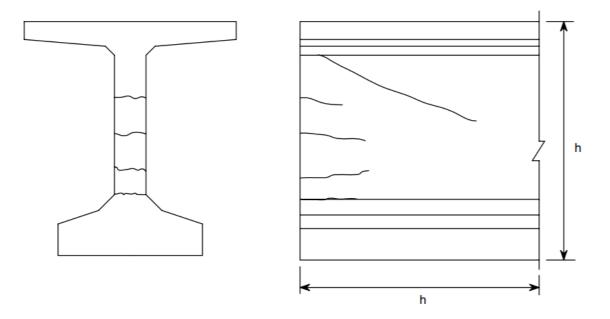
Common Crack Pattern in Precast Bulb Tee Anchorage Zone (Crispino et. al. 2009)
